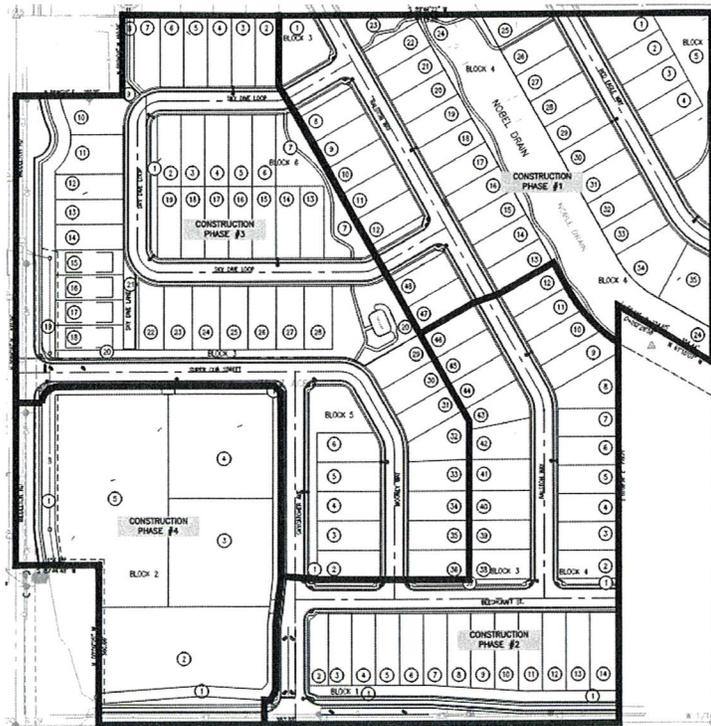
Mason Creek Grove and Mason Creek Landing Preliminary Plats
